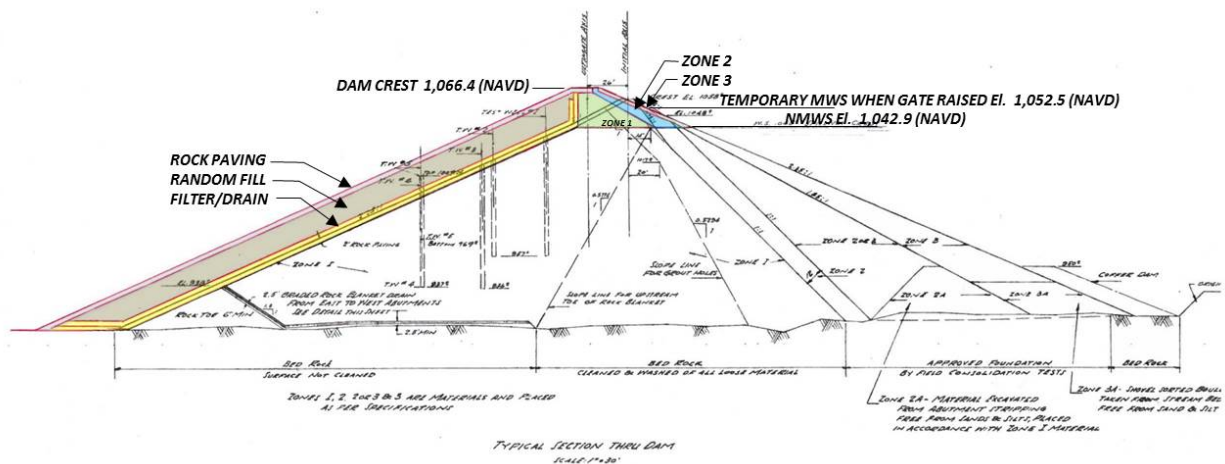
Alternative 4b Dam Raise Section Concept to Pass Hydrometeorological Report 58/59 Probable Maximum Flood
